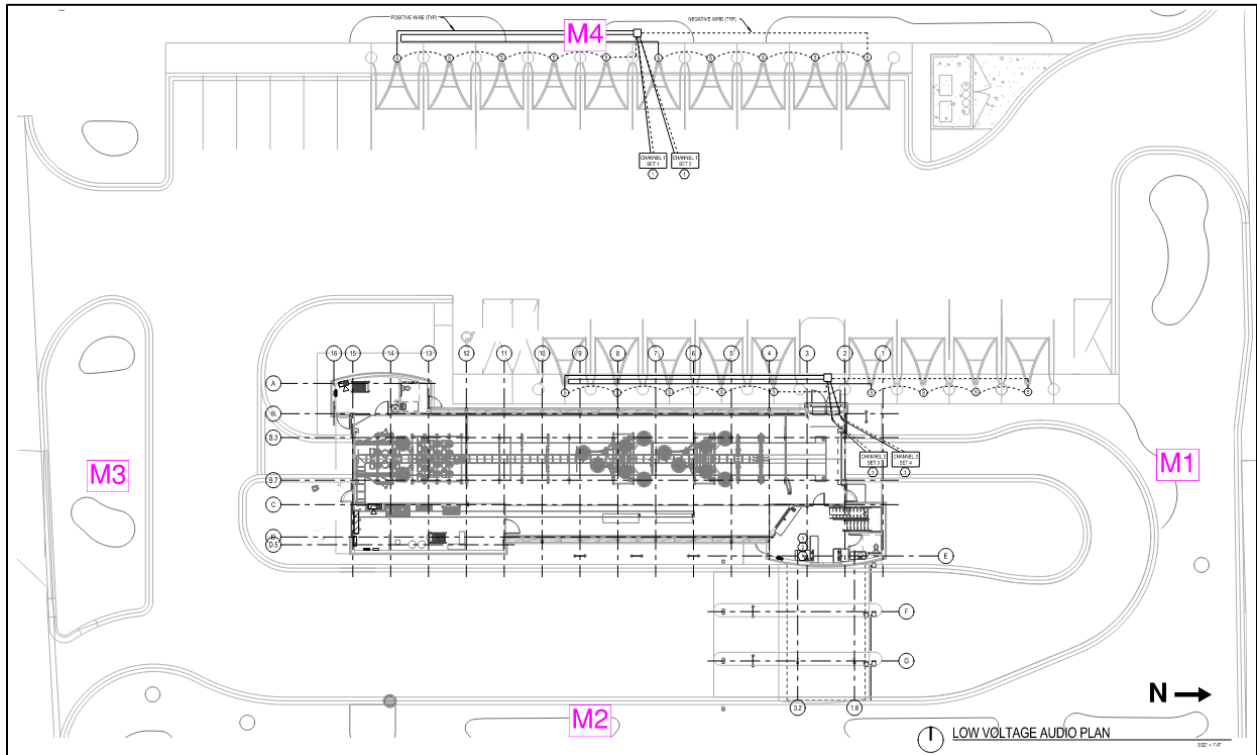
Hudsonville Site Plan with Long-Term Measurement Locations
